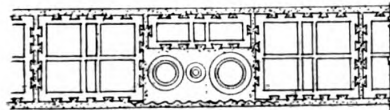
Plan view of pipe chase for plumbing and steam pipes.
